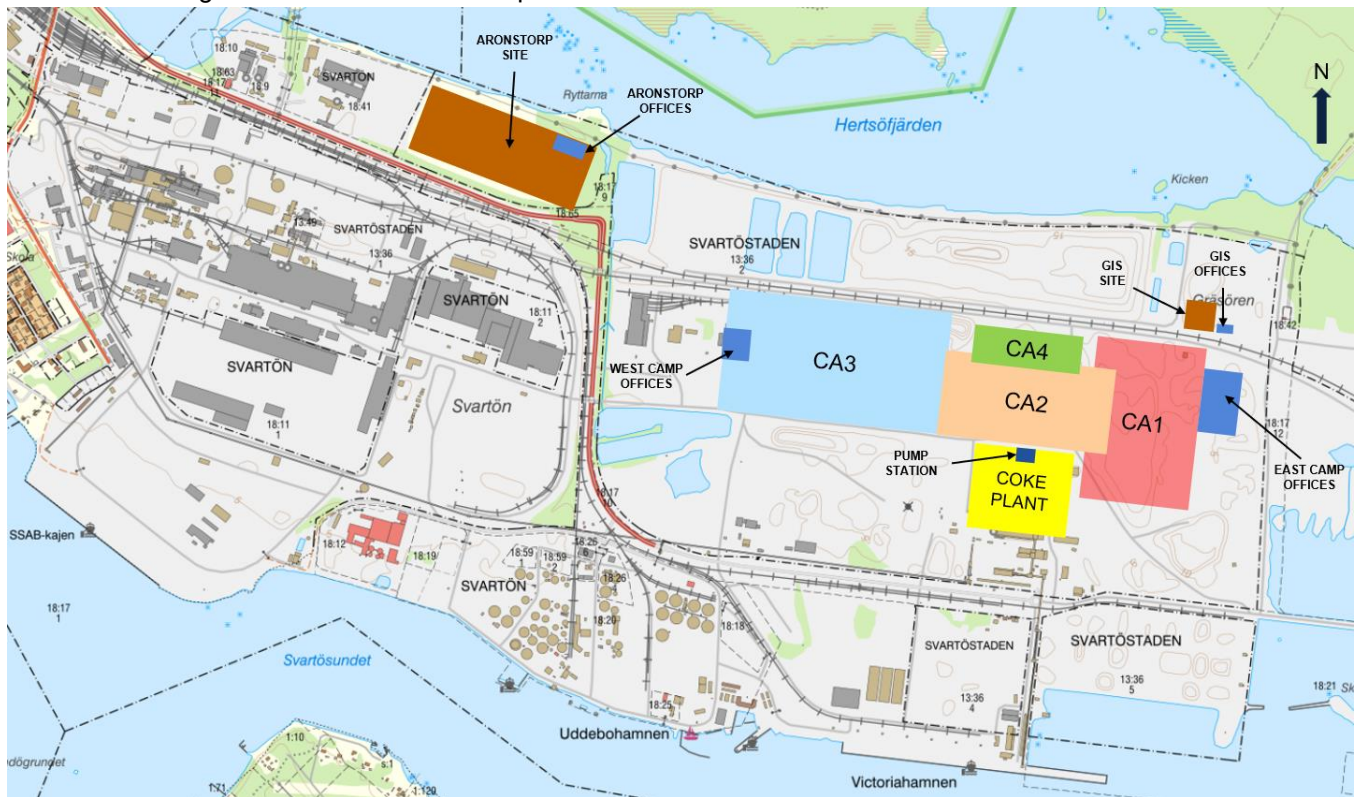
Schematic of Site plan showing CA1 to CA4, site offices, adjacent SSAB production facility and coking plant.
